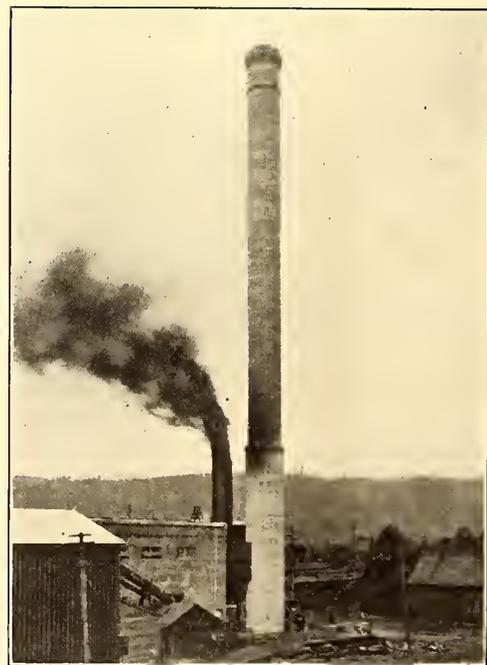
COMPLETED CONCRETE CHIMNEY
